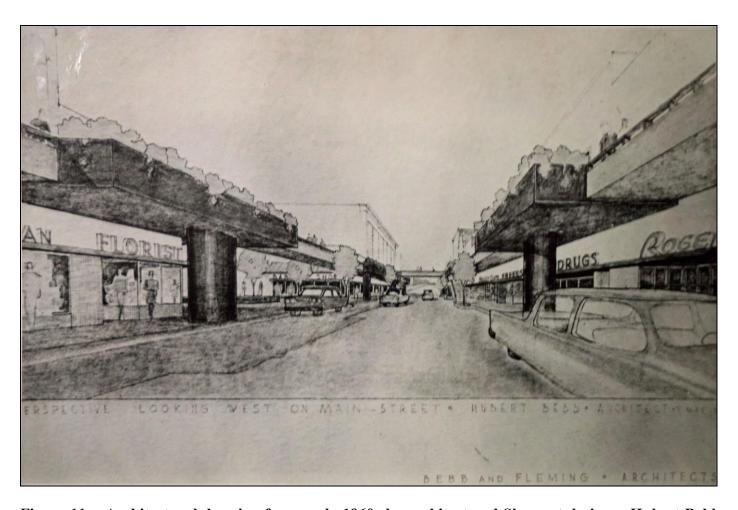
Architectural drawing from early 1960s by architect and Skymart designer Hubert Bebb of Bebb and Fleming Architects. After downtown Morristown encountered several damaging events, including building fires and a destructive 1963 flood, the city embarked on a \$5 million urban renewal initiative to revitalize the downtown area. Bebb's idealistic Skymart plan was a key part of this effort, much funding for which came from owner of the downtown commercial properties.
